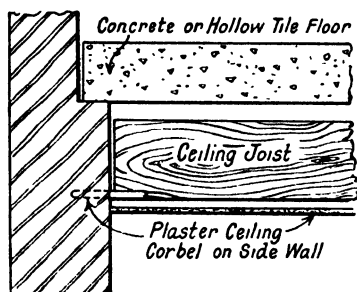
INDEPENDENT CEILING BELOW CONCRETE OR HOLLOW TILE FLOOR
